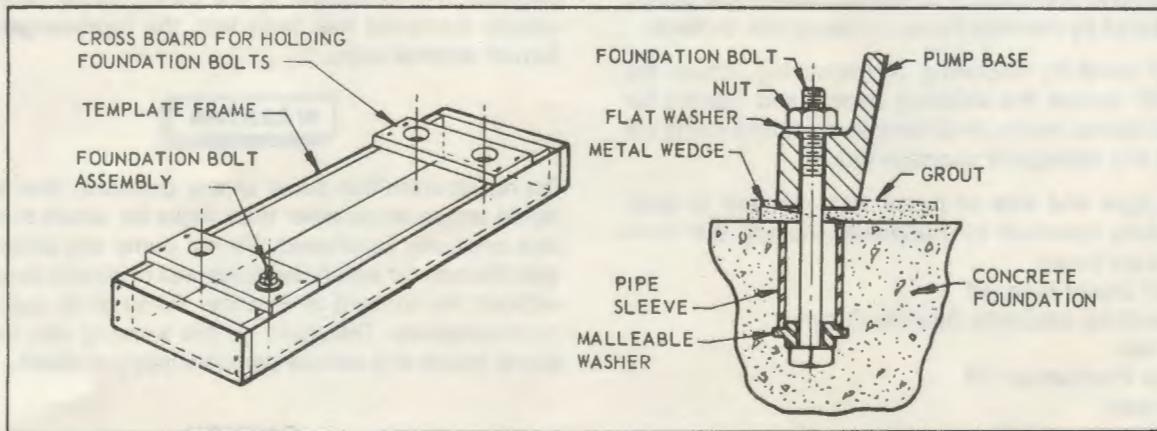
FOUNDATION BOLT LOCATION AND ANCHORAGE
